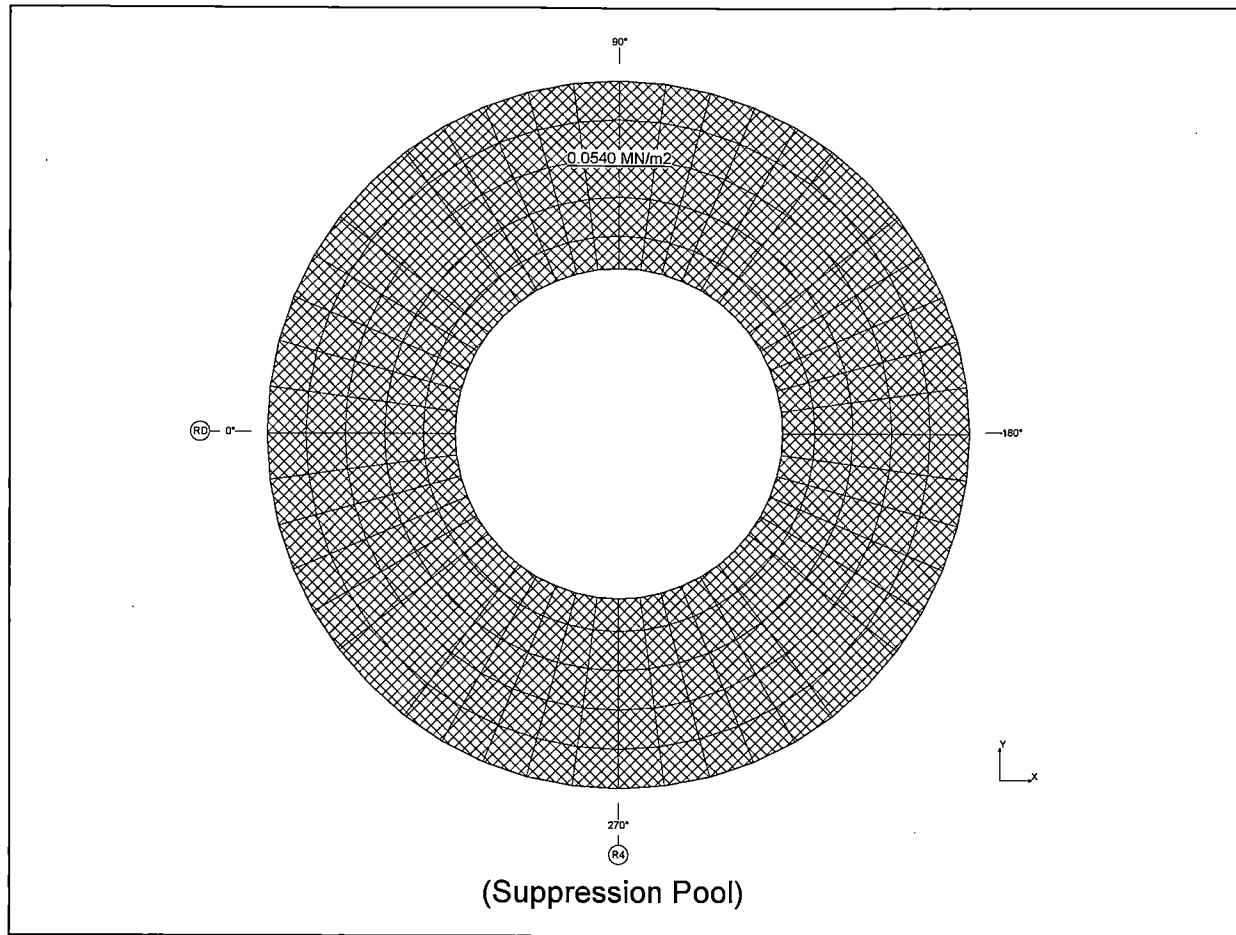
Hydrostatic Loads on the Suppression Pool Floor Liner
